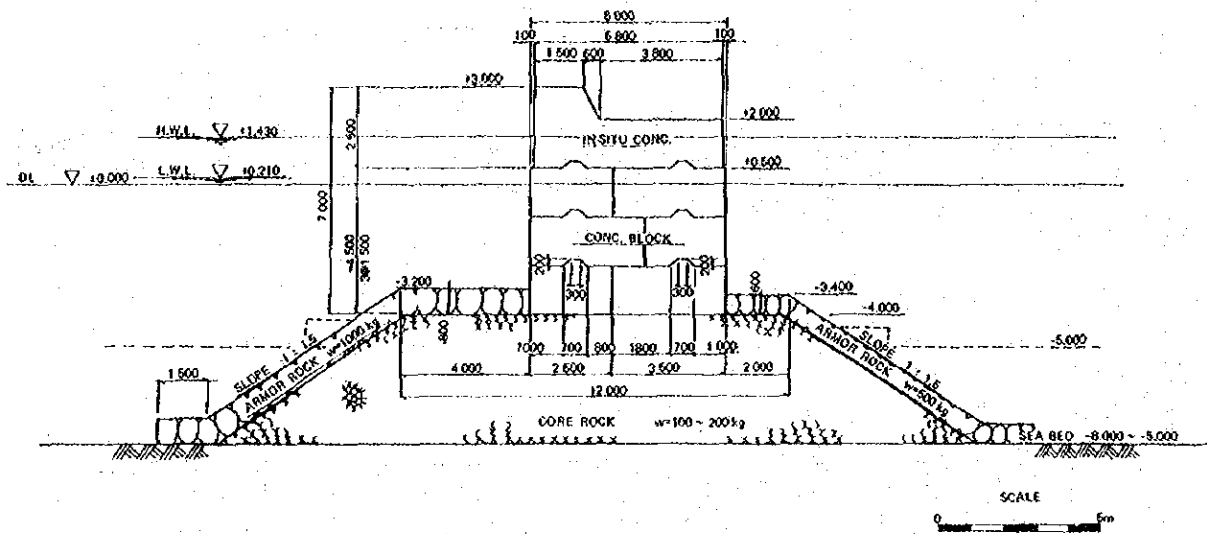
Cross Section of Breakwater (4) – Lucena Port
